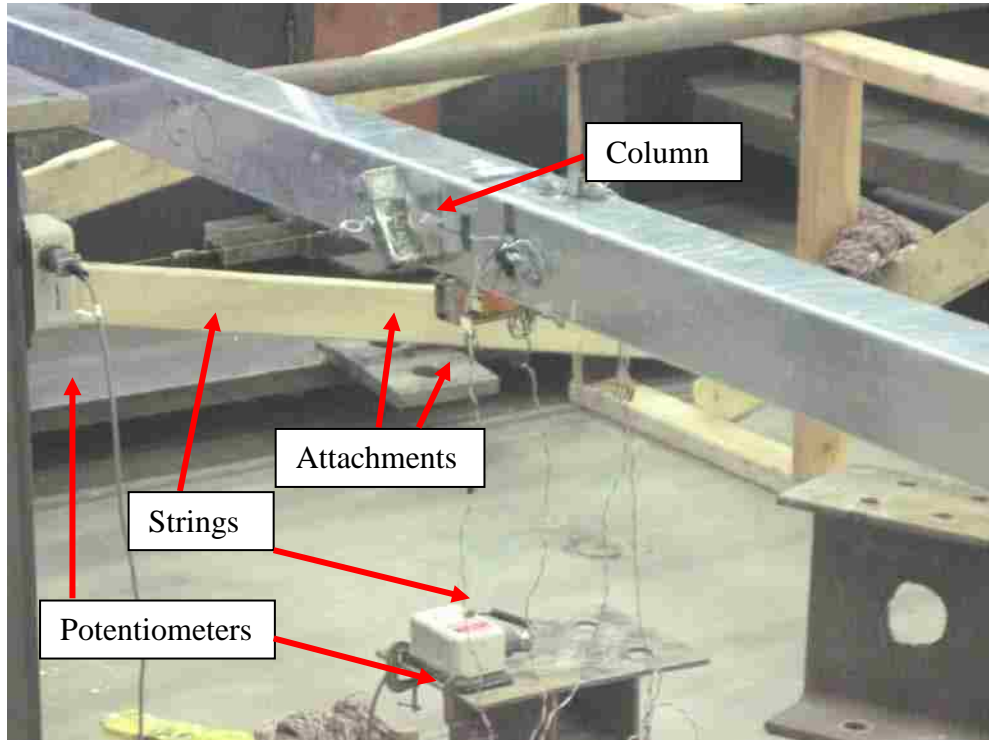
Photo of Vertical and Horizontal Transverse String Potentiometers During Test to Failure
